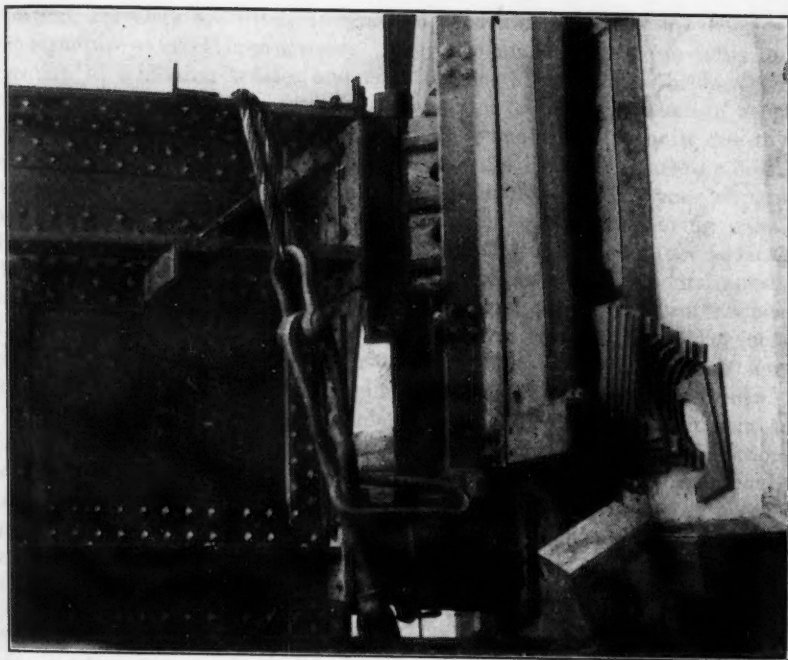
HYDRAULIC JACK RAISING SPAN TO RELEASE FALSEWORK.
